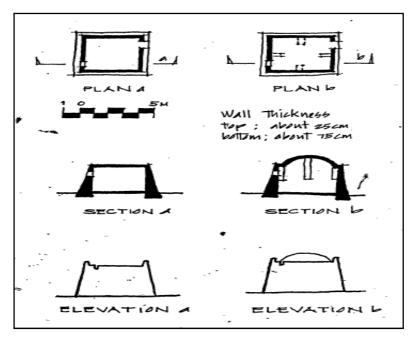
The Mud Roofed Rectilinear House Form: a – Flat Roof, b – Doomed Roof.
